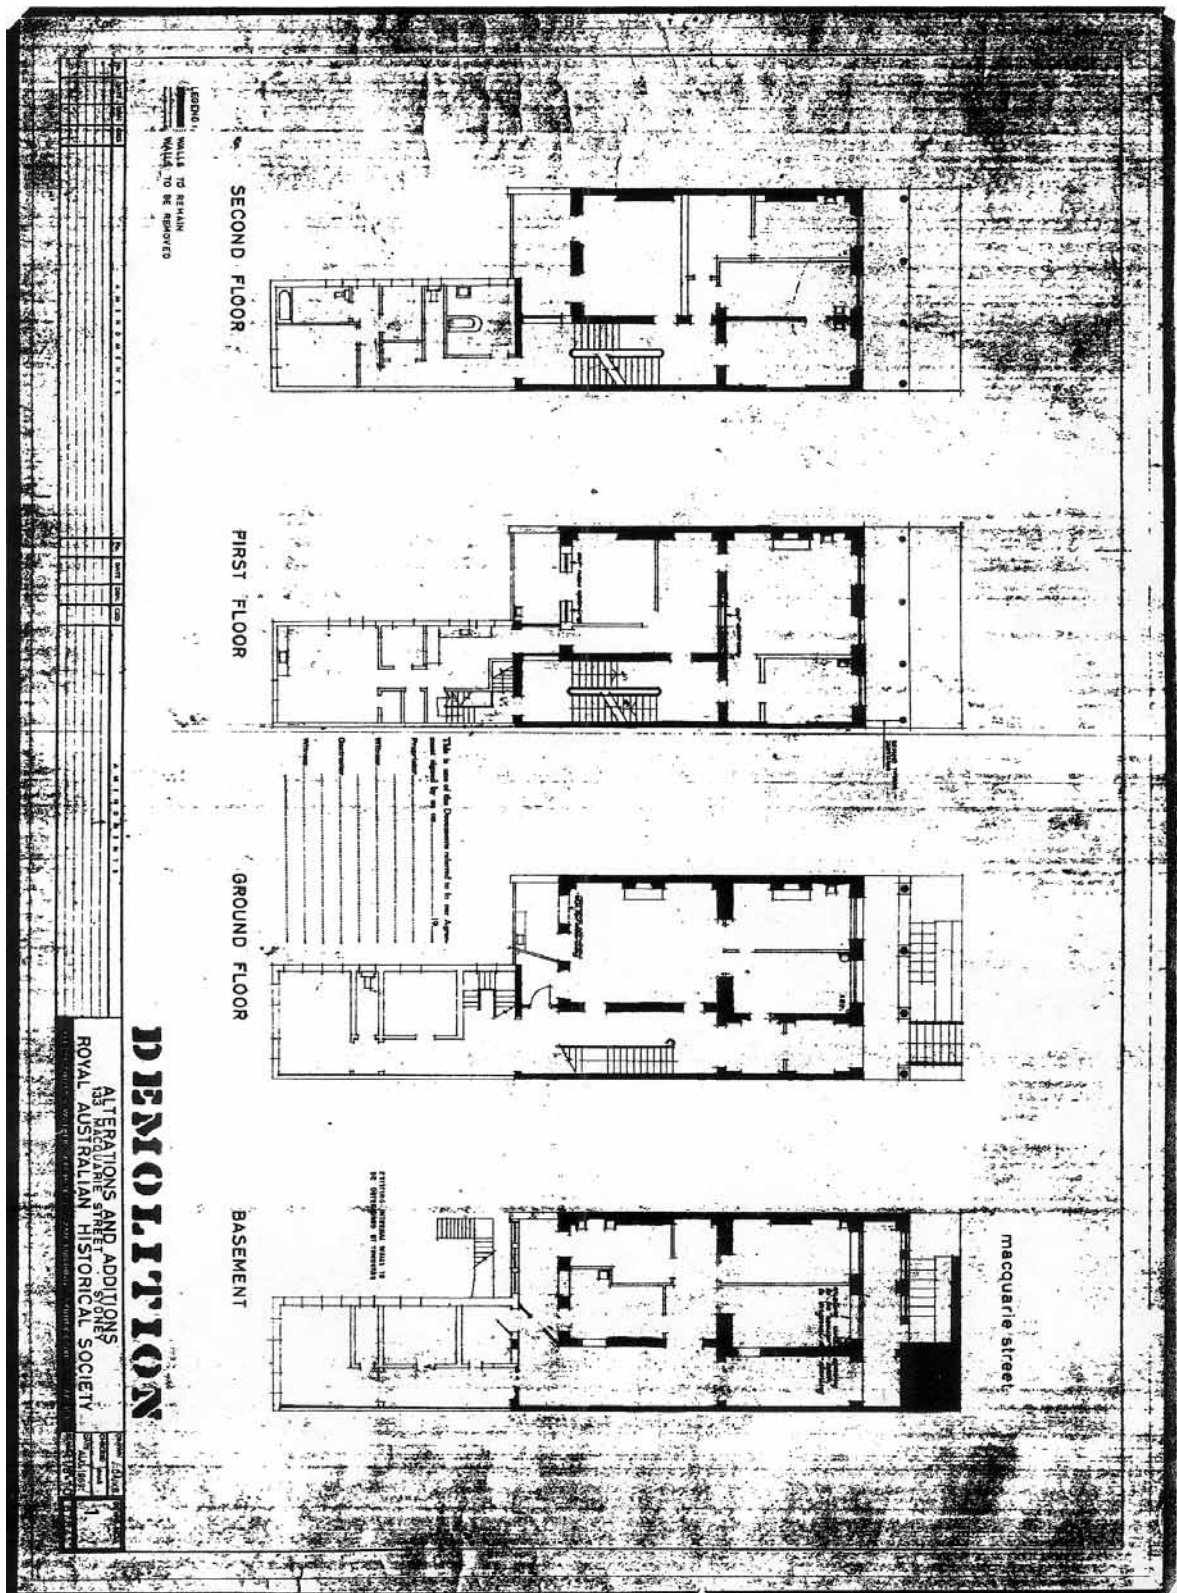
Floor plans by Peddle Thorp & Walker, showing existing configuration before alterations and additions, 1969. Walls to be removed are shown not filled.
